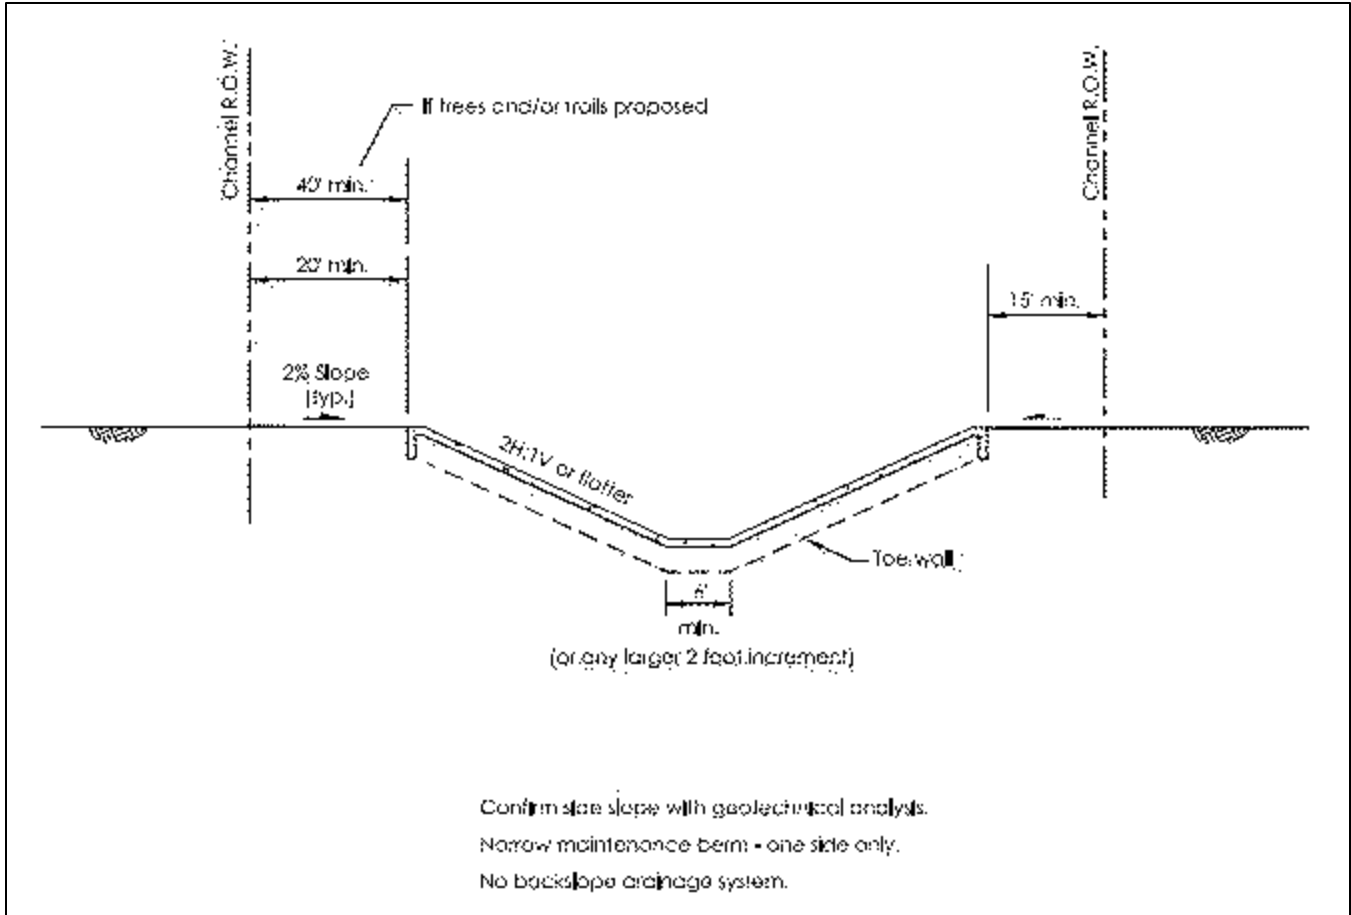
HCFCD Concrete-lined Trapezoidal Channel Design (HCFCD, 2019)
